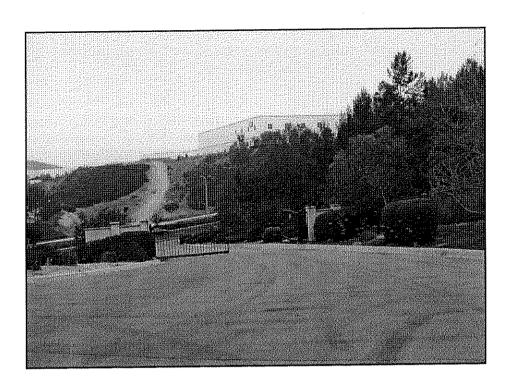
View from Site Looking Northwest toward Bake Parkway
